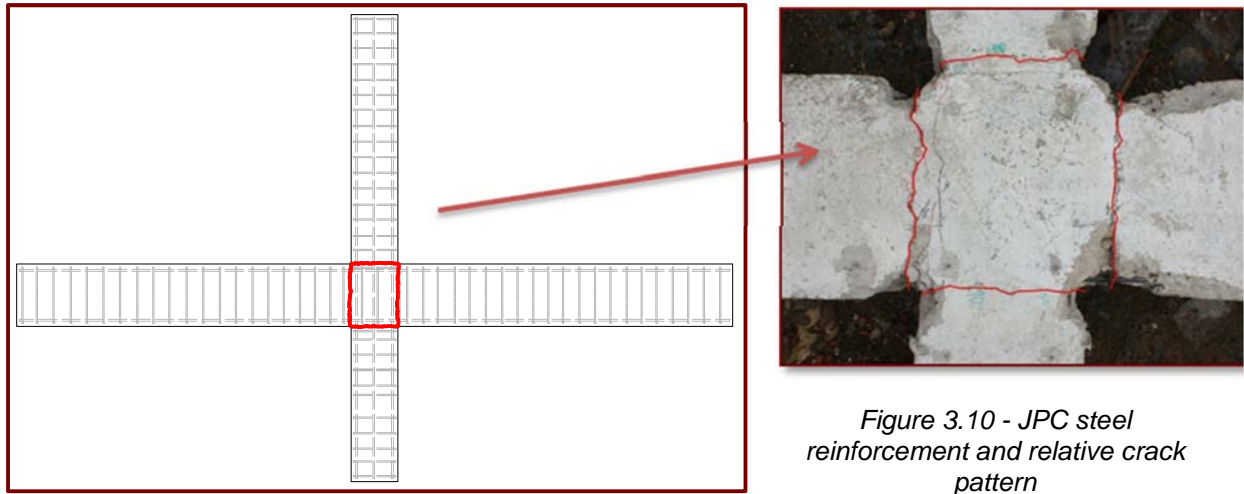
JPC steel reinforcement and relative crack pattern
